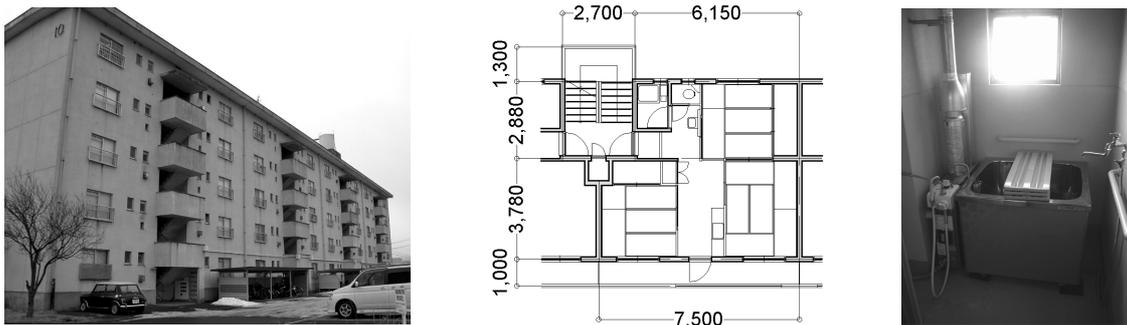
A Residential Building, a Dwelling Unit Plan, and a Bathroom Constructed in the Early 1970s
